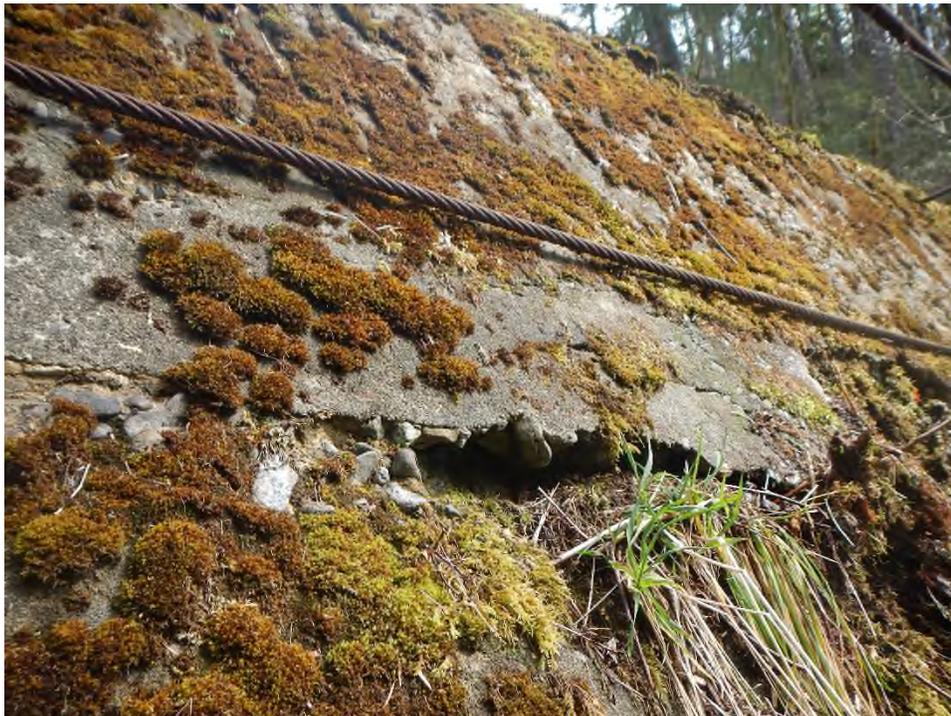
Horizontal cracking and erosion on downstream dam face approximately 1 m below the crest.
